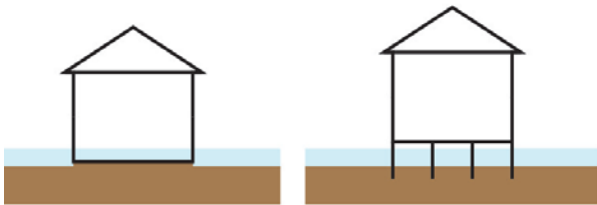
Pier Existing Construction* (NYC Department of Planning 2013a)
